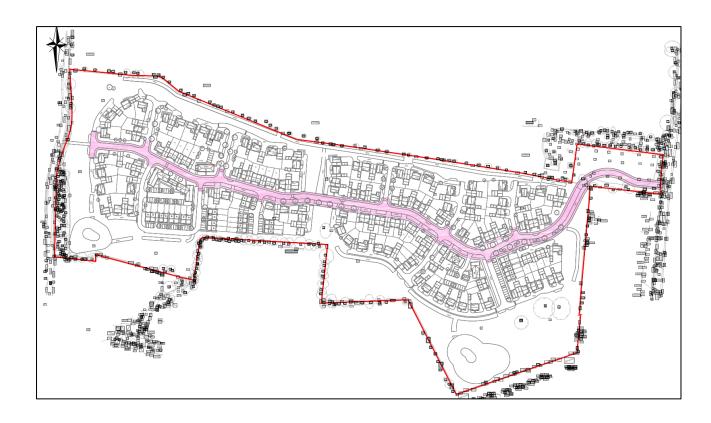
Consented Site Layout / Highway Adoption Plan
